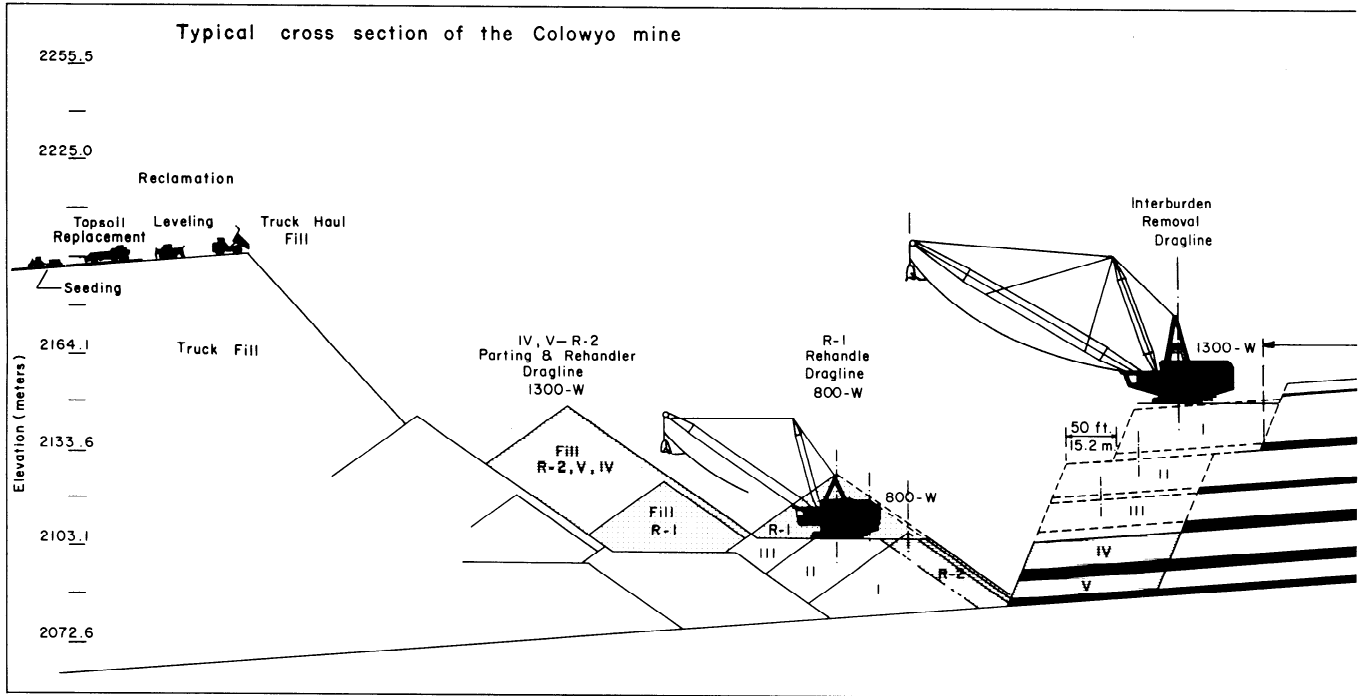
Typical cross section of Colowyo mine.
